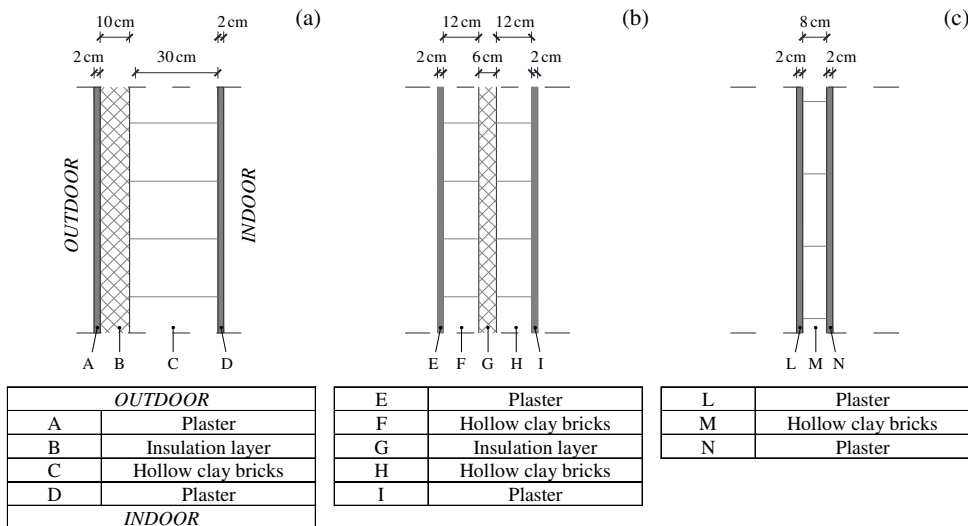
External and internal infill masonry wall typologies: (a) EWA-0, (b) IWA-0, (c) IWA-1.
